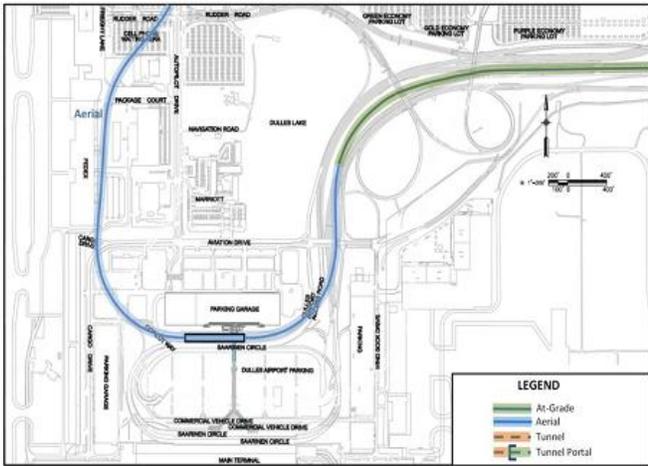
Proposed Aerial Station and Alignment – Dulles International Airport Station
